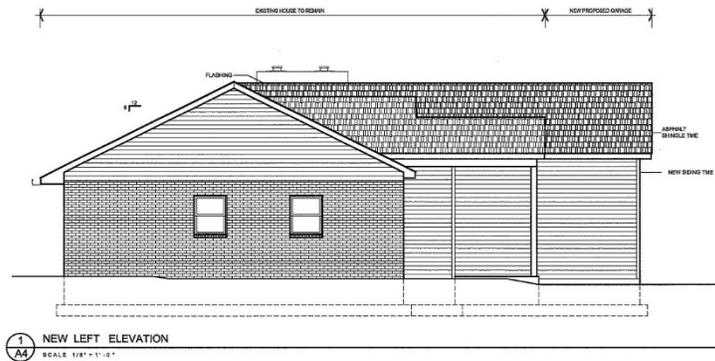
PROPOSED EASTERN ELEVATION SOURCE: APPLICANT
